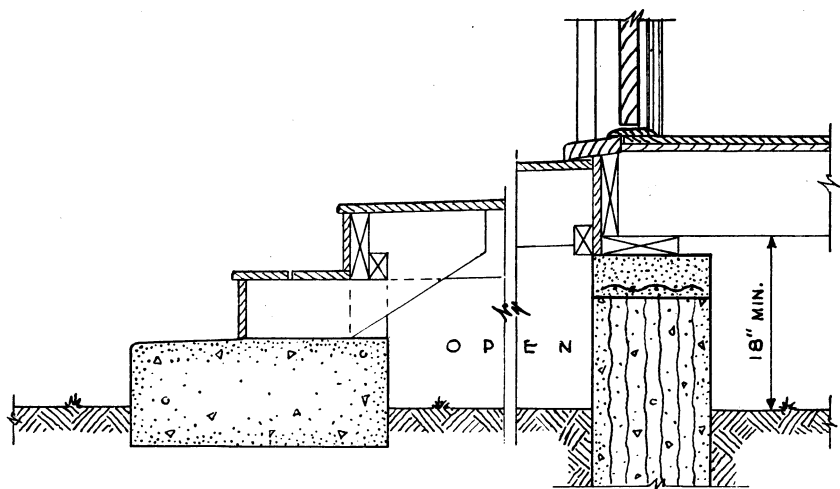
Wooden steps or porch protected from hidden infestation by resting carriage on a poured-concrete base which forms the lower step. Platform attached to building above the poured-concrete cap on foundation wall or pier.
